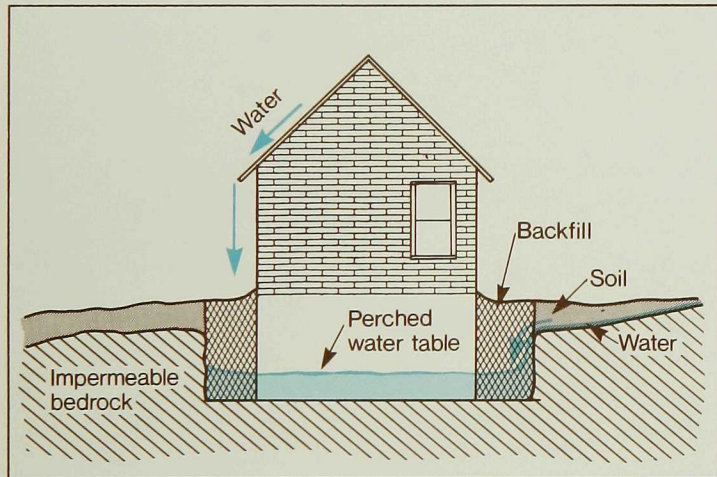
A house excavation formed in impermeable bedrock has caused perched ground water to form.
